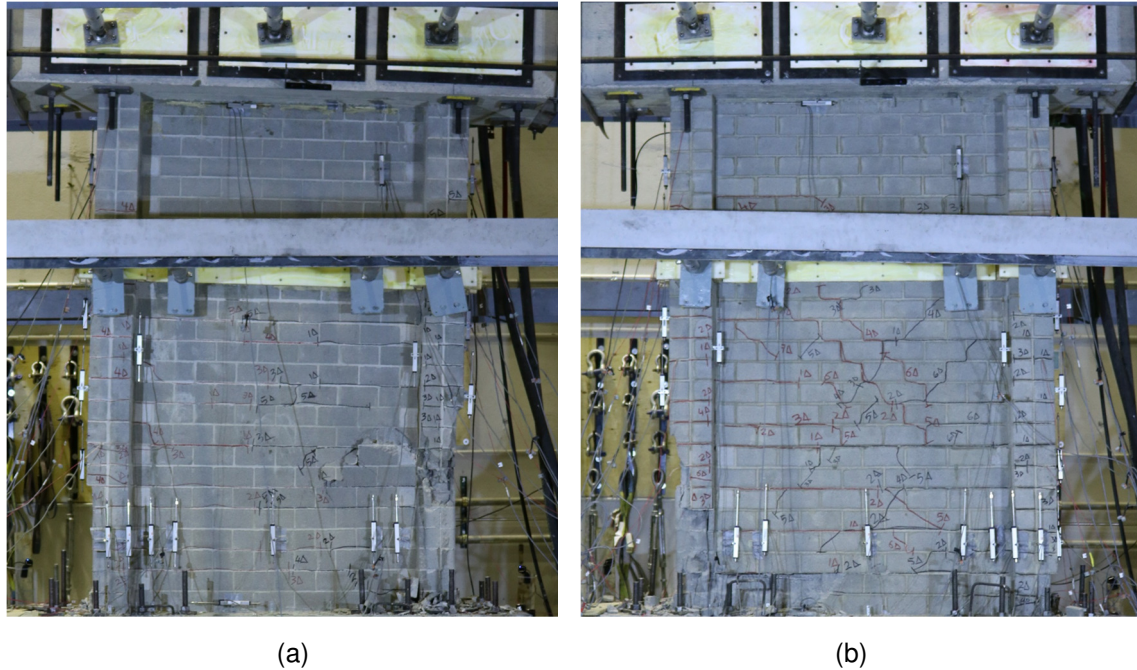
Final damage state: (a) Wall W1; (b) Wall W2
